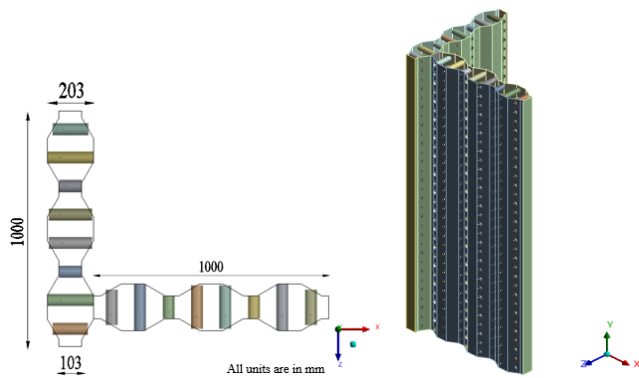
Top view and isometric view of L-shaped corrugated SSCPW
